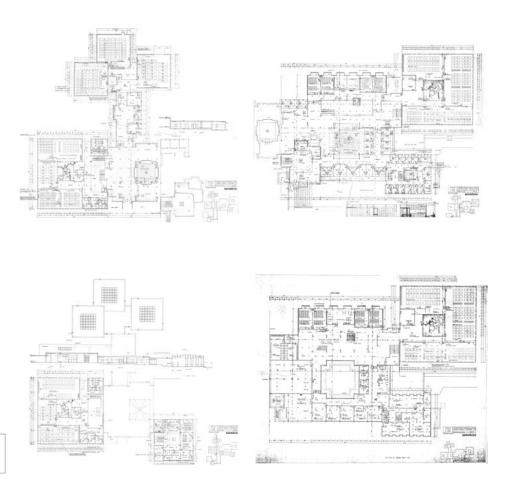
Typical dormitory building drawing in the competition entry, traces of the open-plan idea.
